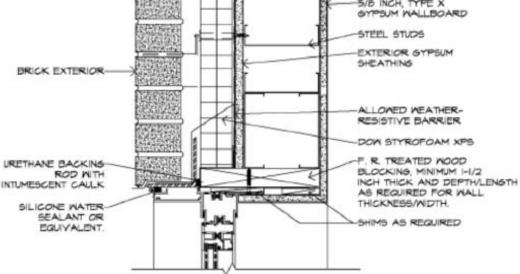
WINDOW HEAD DETAIL-FRTW WOOD BLOCKING-FRAMED WALL
